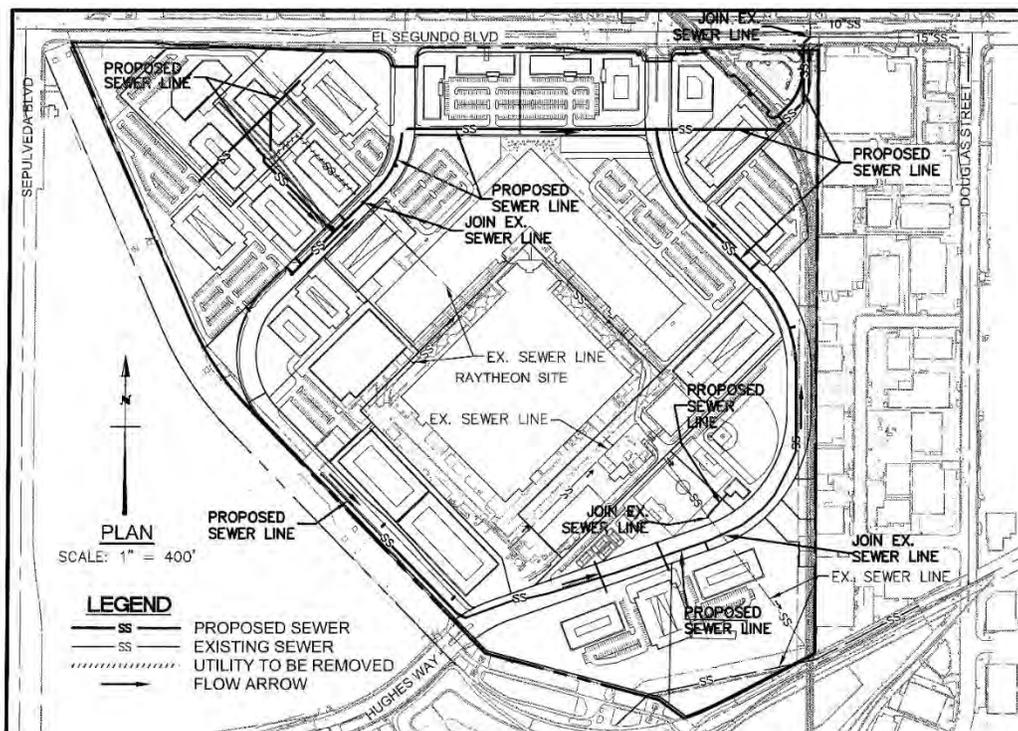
CONCEPTUAL SEWER PLAN
